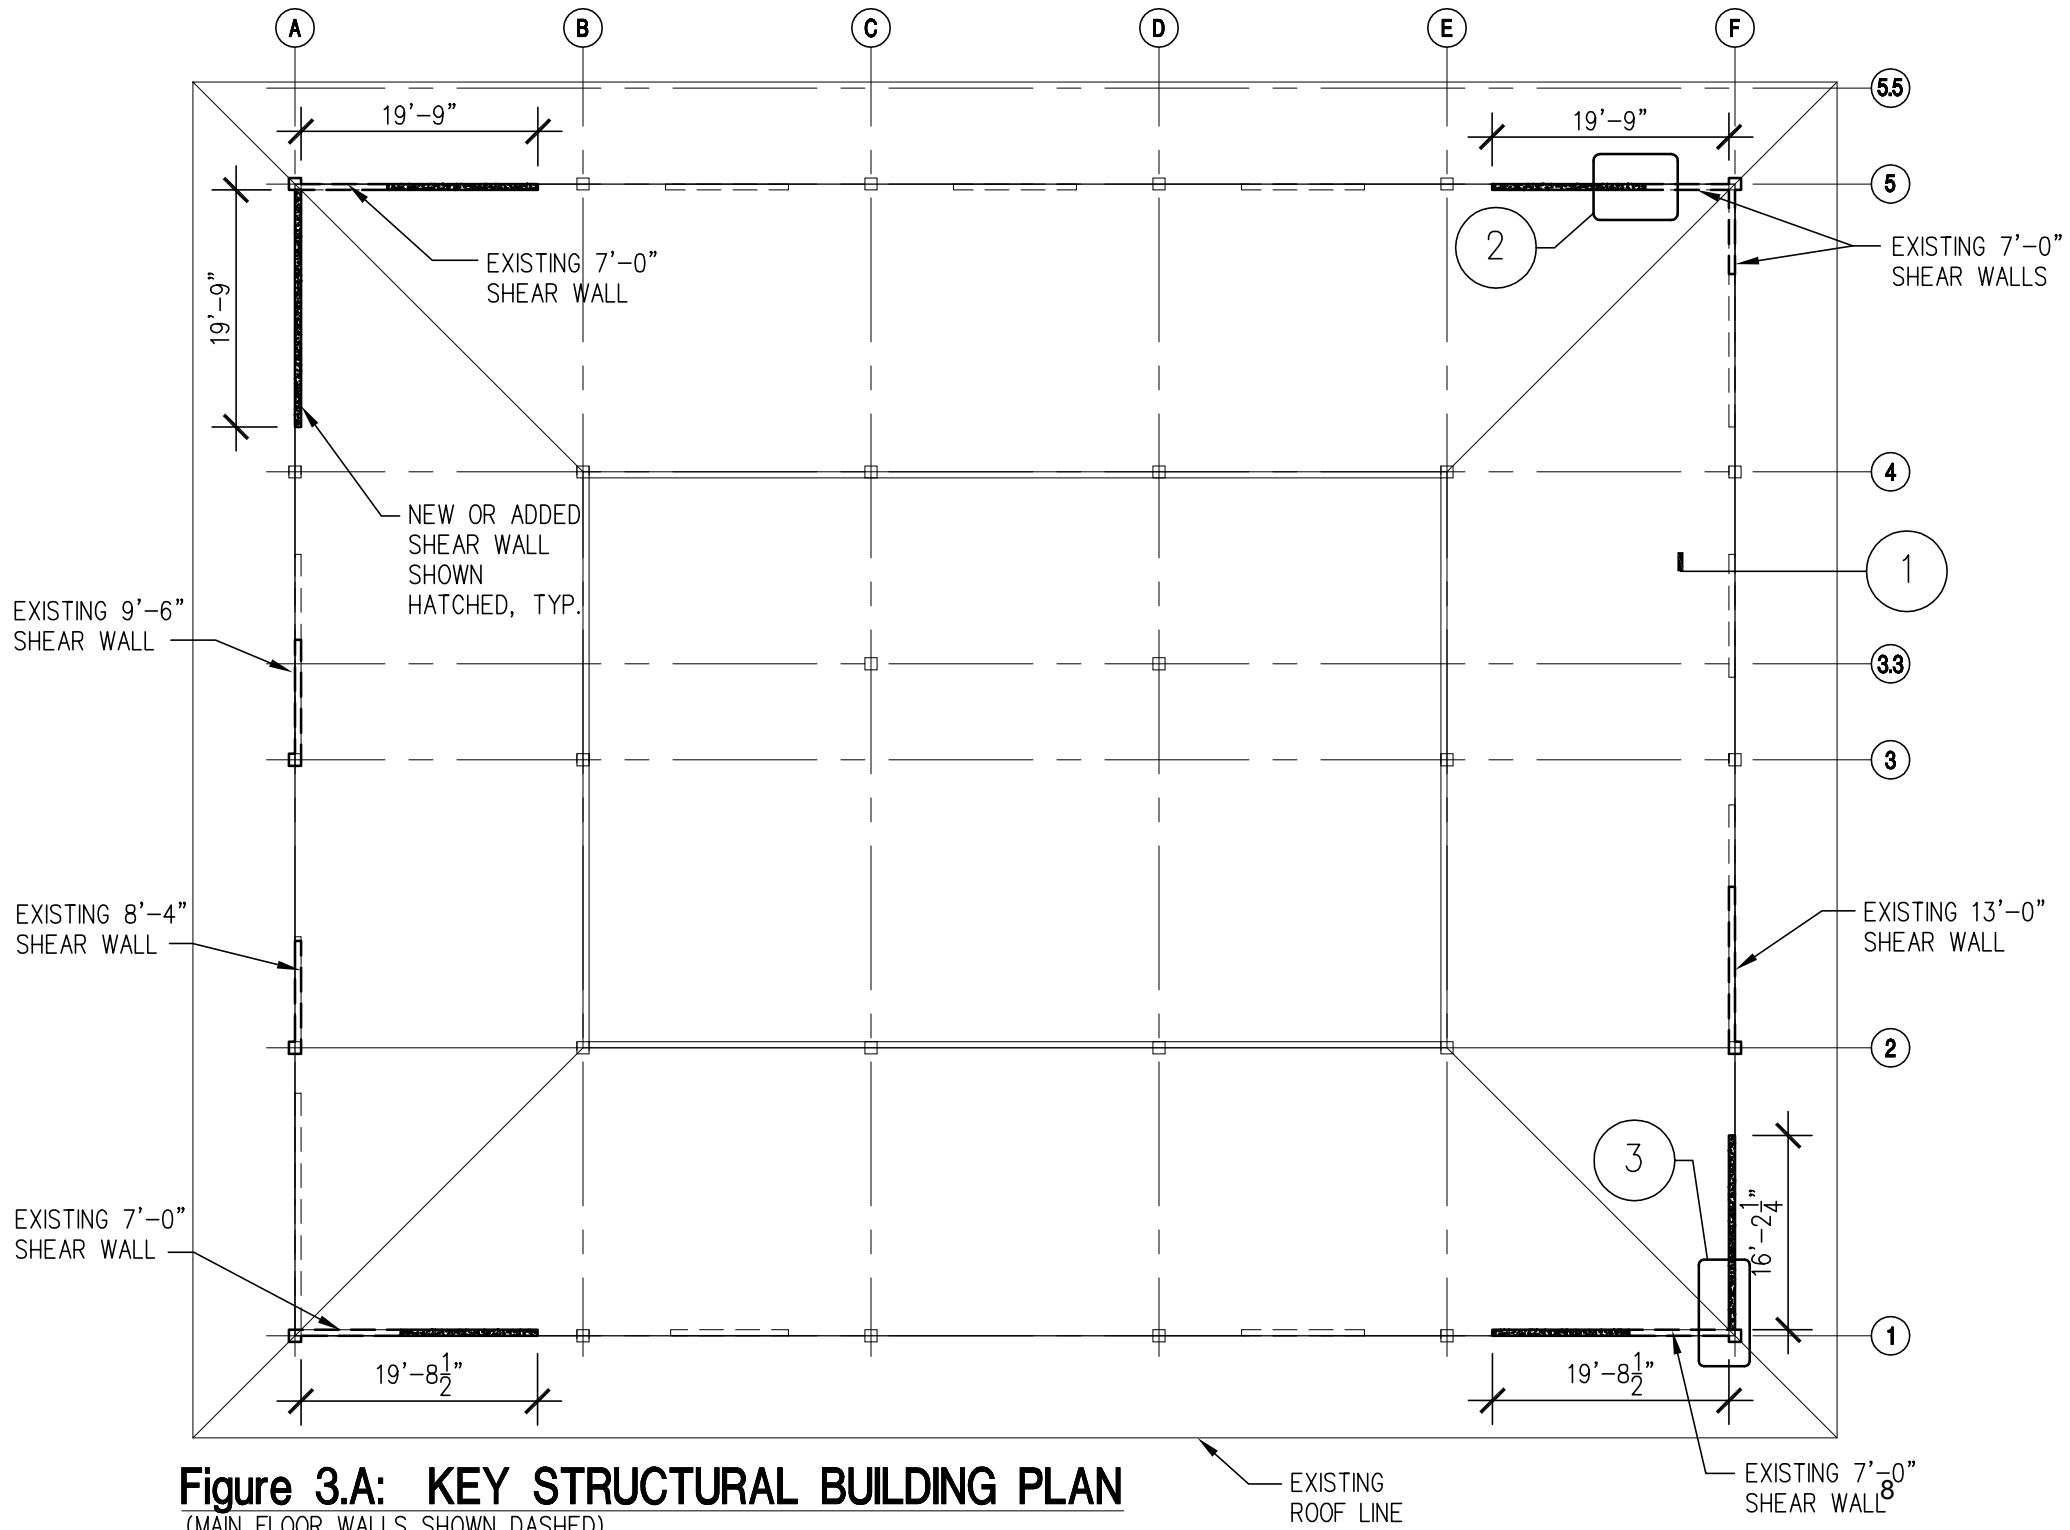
A: KEY STRUCTURAL BUILDING PLAN
